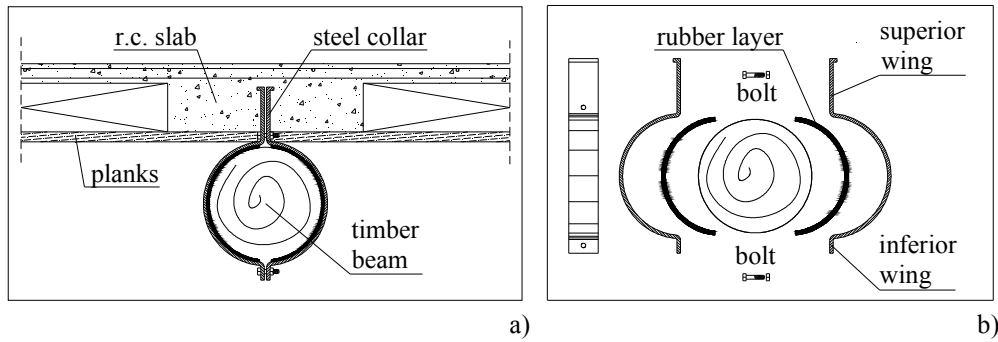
Composite timber-steel-concrete floor: a) Structural section;
